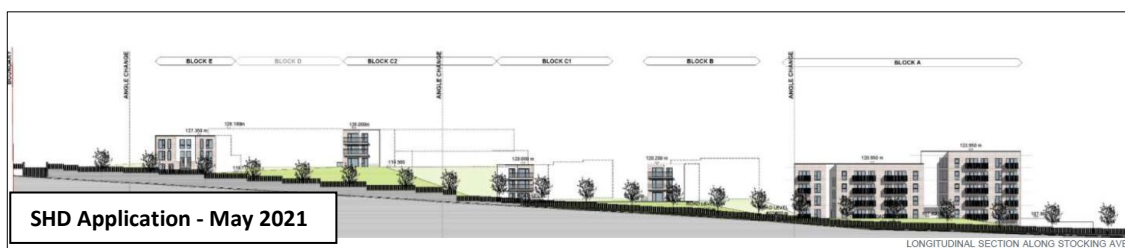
Site Section: Proposed Development May 2021 (Source: RAU.)
